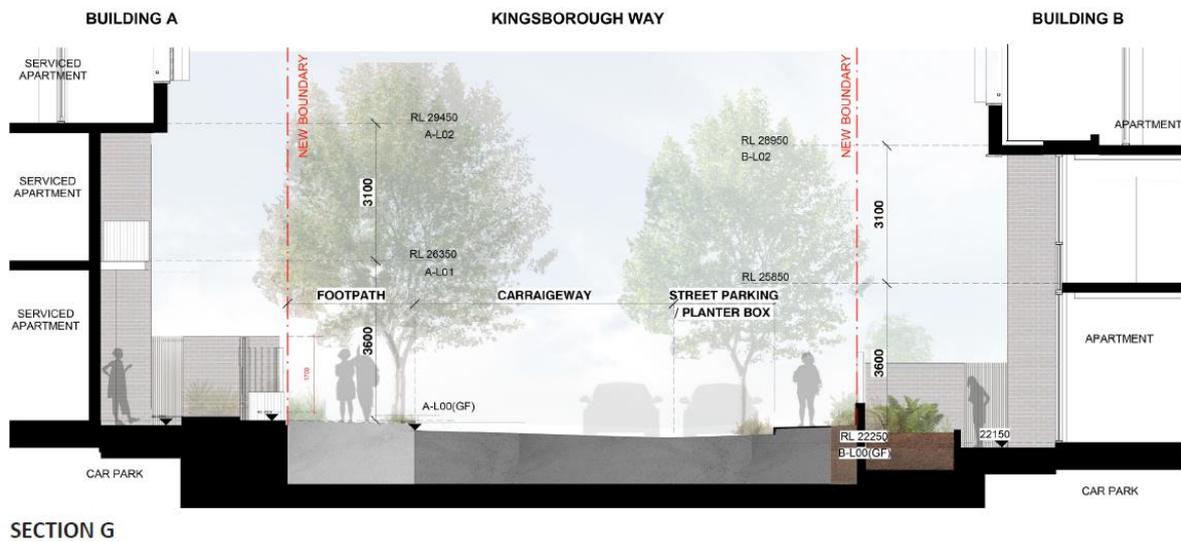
Proposed section of ground floor apartments, through Kingsborough Way
